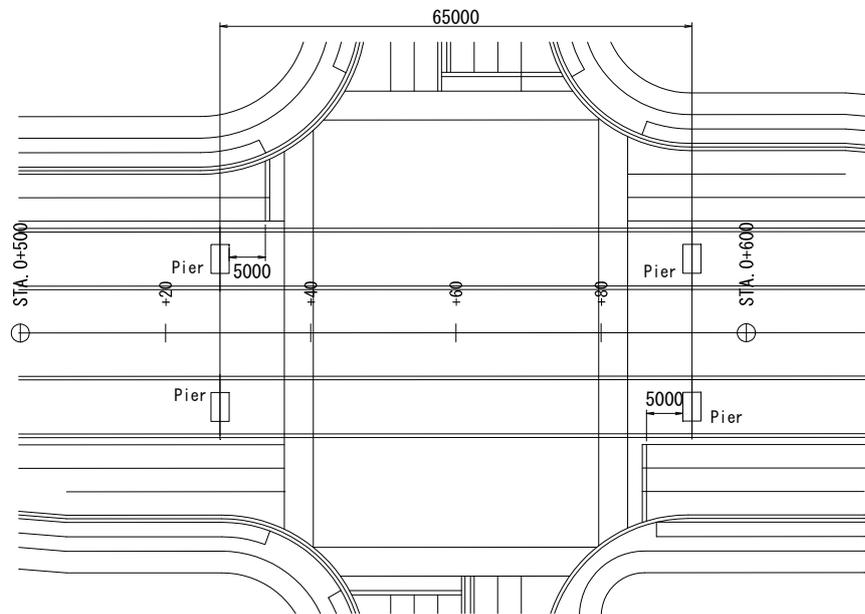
Pier locations of Main Bridge at TAZARA Intersection
